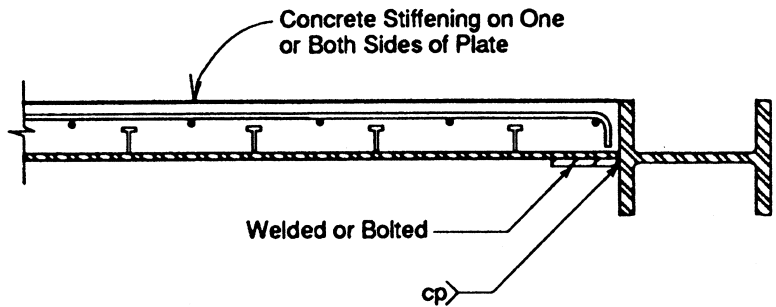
Concrete stiffened steel shear wall with steel boundary member.
